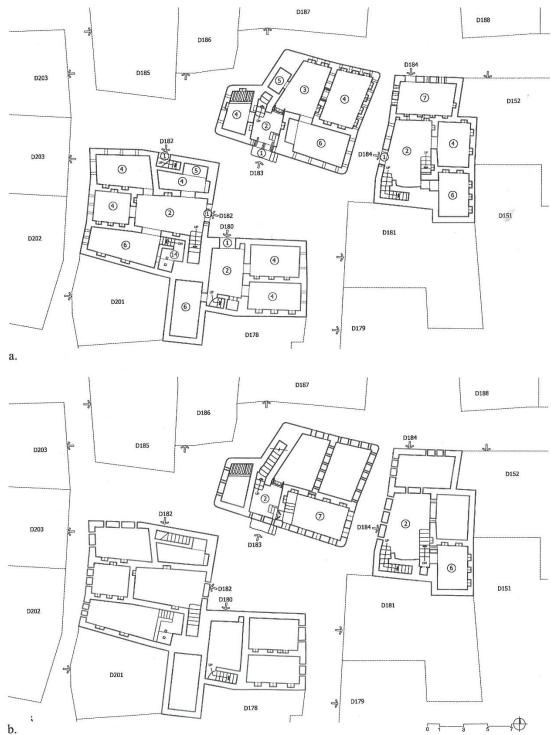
Floor plans of dwelling cluster SD46, SD50 & SD51; *a*. Ground floor; *b*. First floor; *d*. Roof and second floor; 1. main entrance door; 2. First *dahreez*; 3. Second *dahreez*; 4. *suffah*; 5. *caqid*; 6. *darss*; 8. *carshah*; 9.*gurafah*; 11. Kitchen store ; 12. Kitchen; 14. Latrine.
